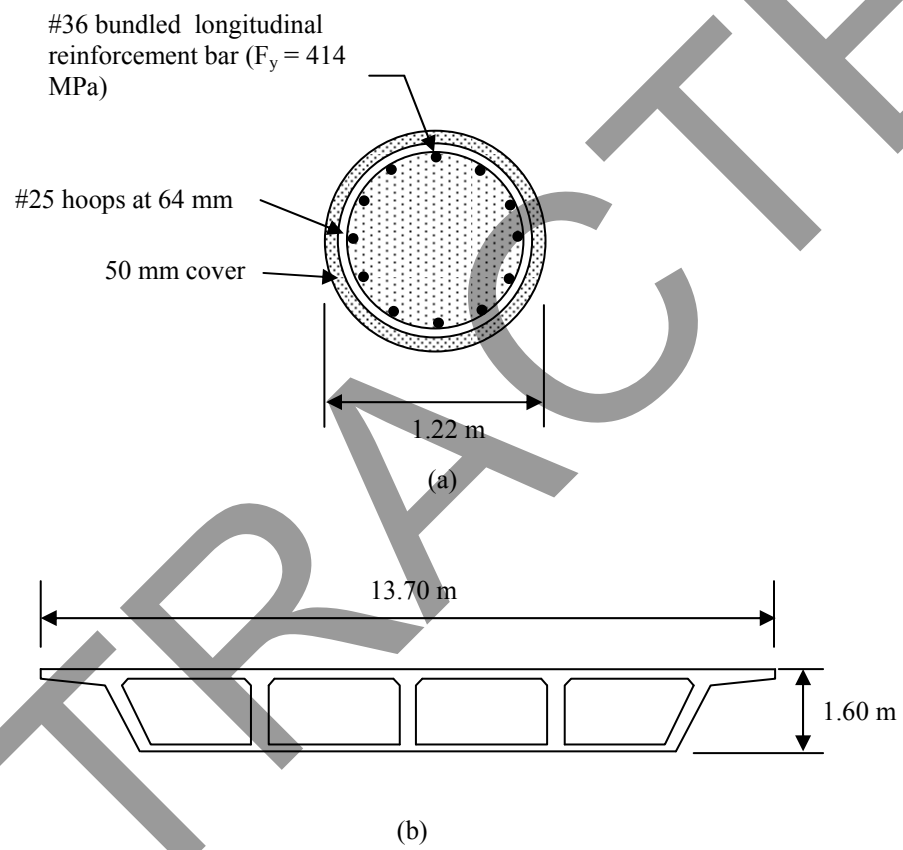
(a) Typical column and (b) Bridge deck cross-sections.
